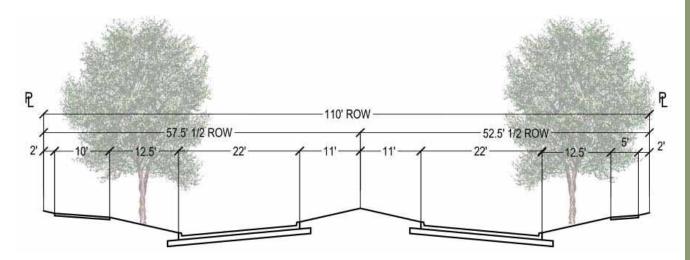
NE BEAVERBROOKE BOULEVARD - LOOKING EAST
